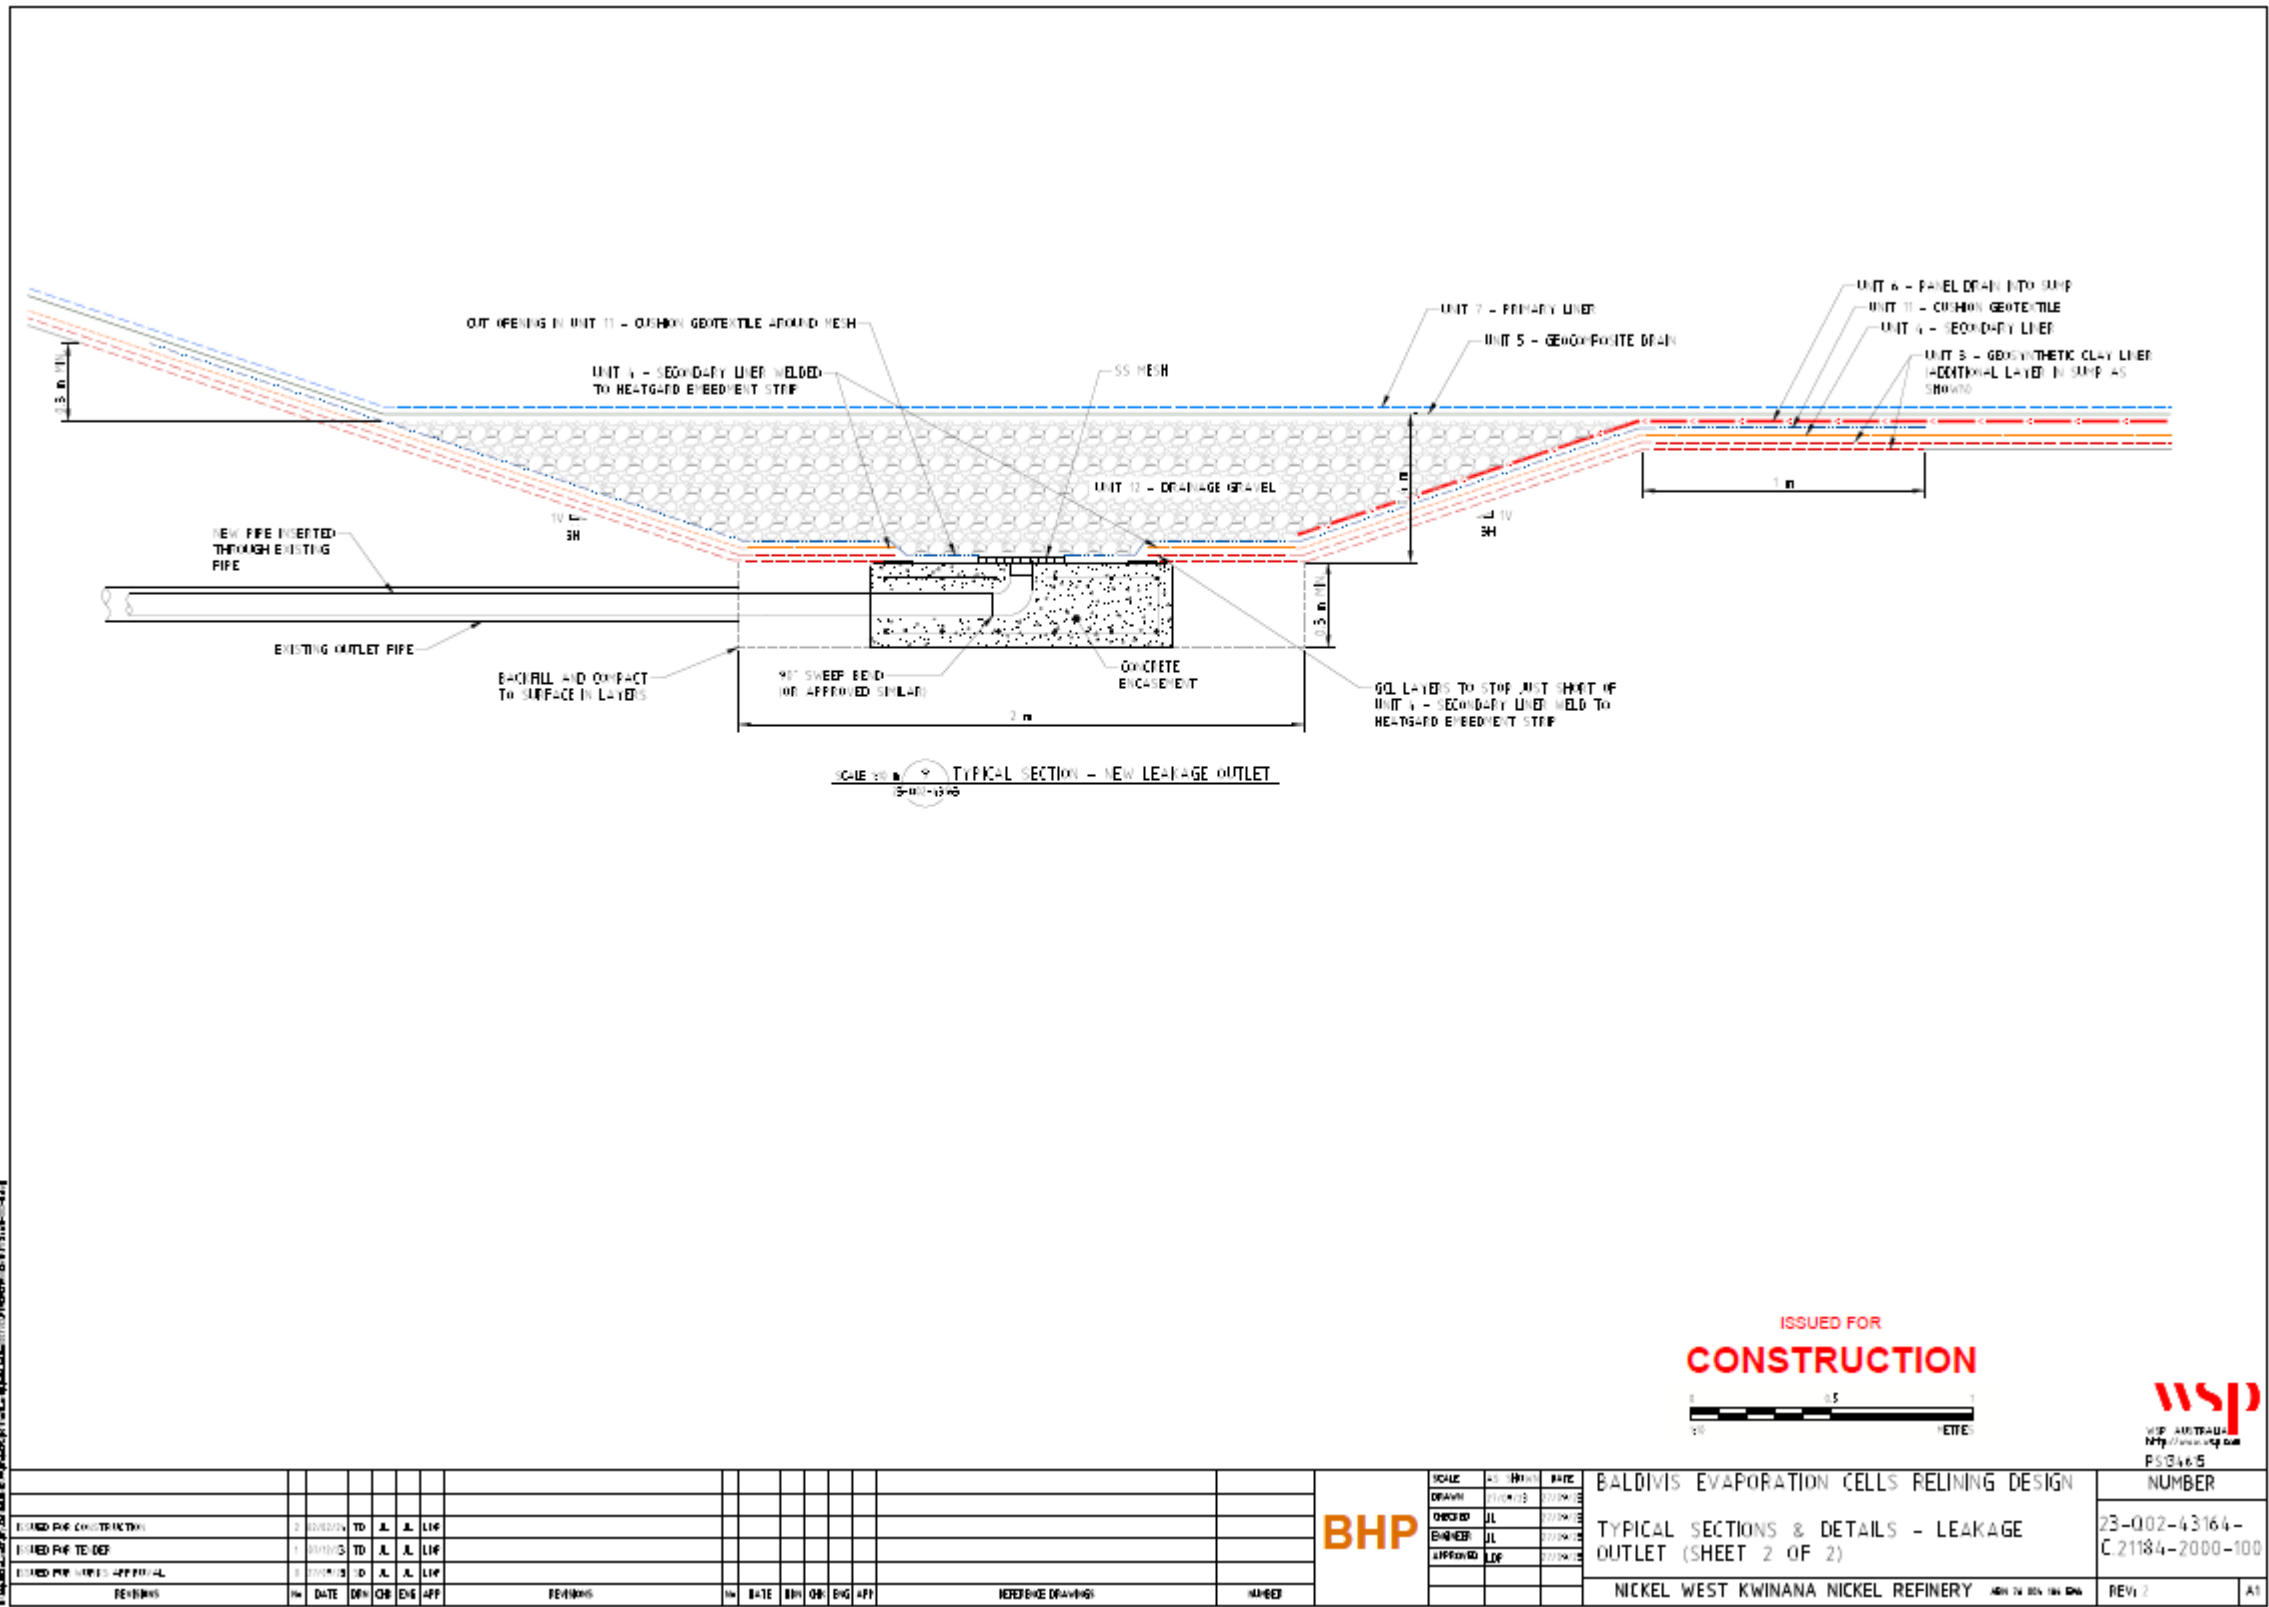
Underdrainage system outlet showing new outlet pipe in relation to concrete encasement and drainage layer
